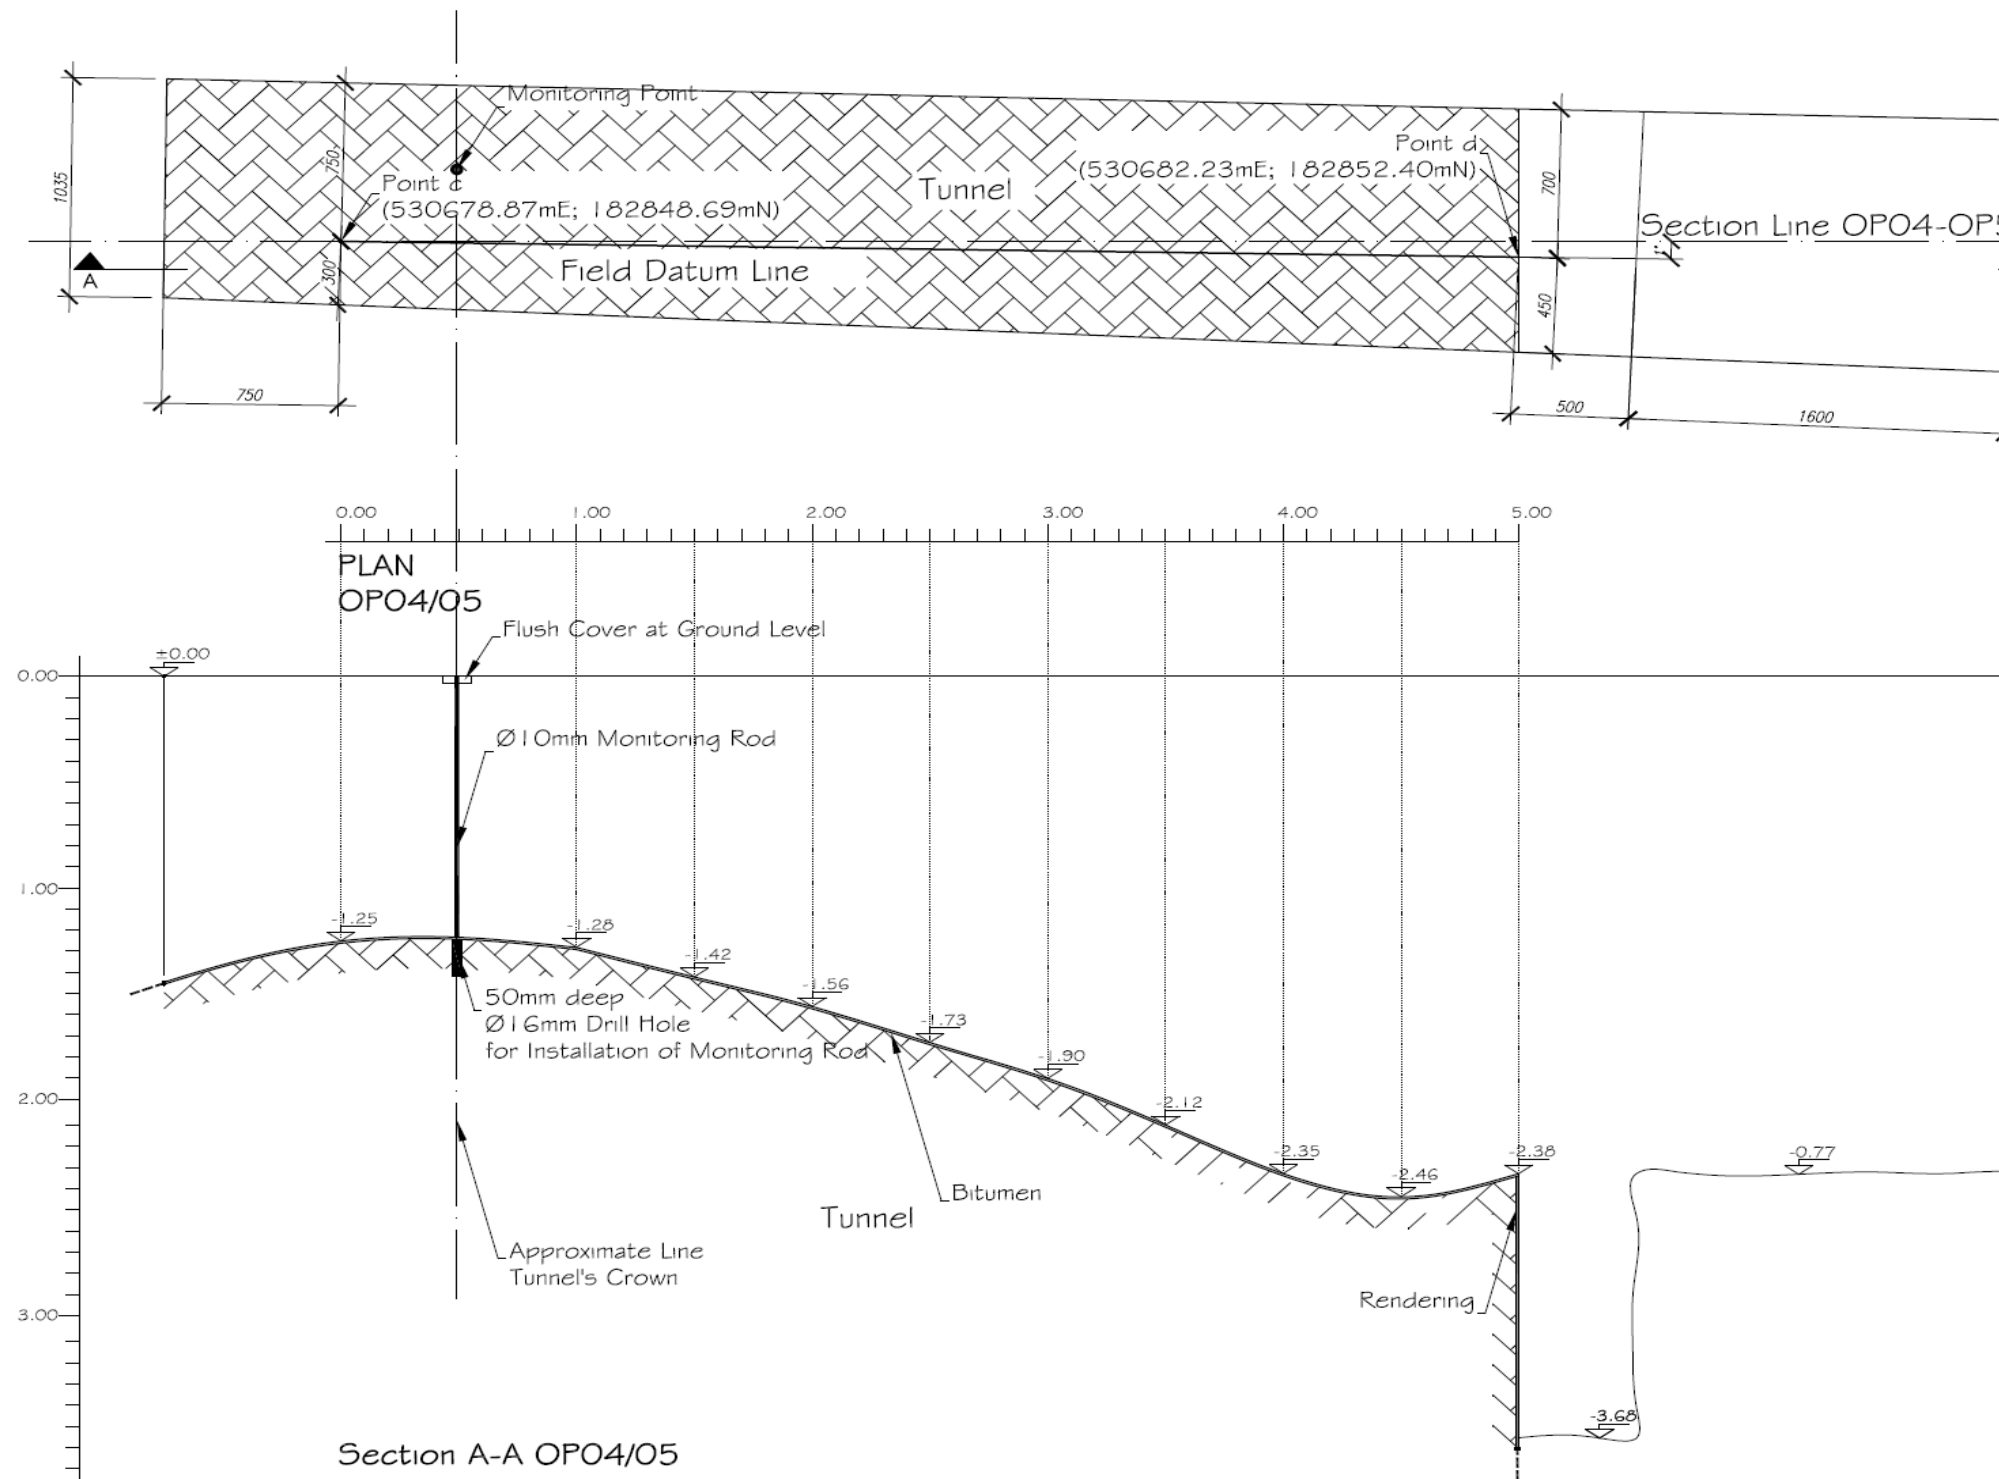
Plan and section through trial pit OP04-05 (Concept Site Investigations 2011) – Not to scale
